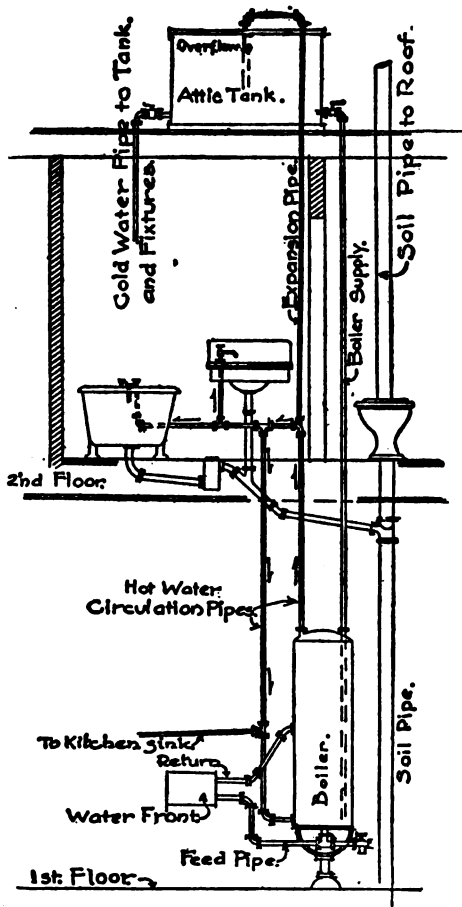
Somewhat more elaborate plumbing system than that in Fig. 510; in this case the water tank is on the third floor and the bathroom, complete, on the second. Sinks, tubs, etc., are connected with a single soil pipe requiring a sewage disposal equipment.
